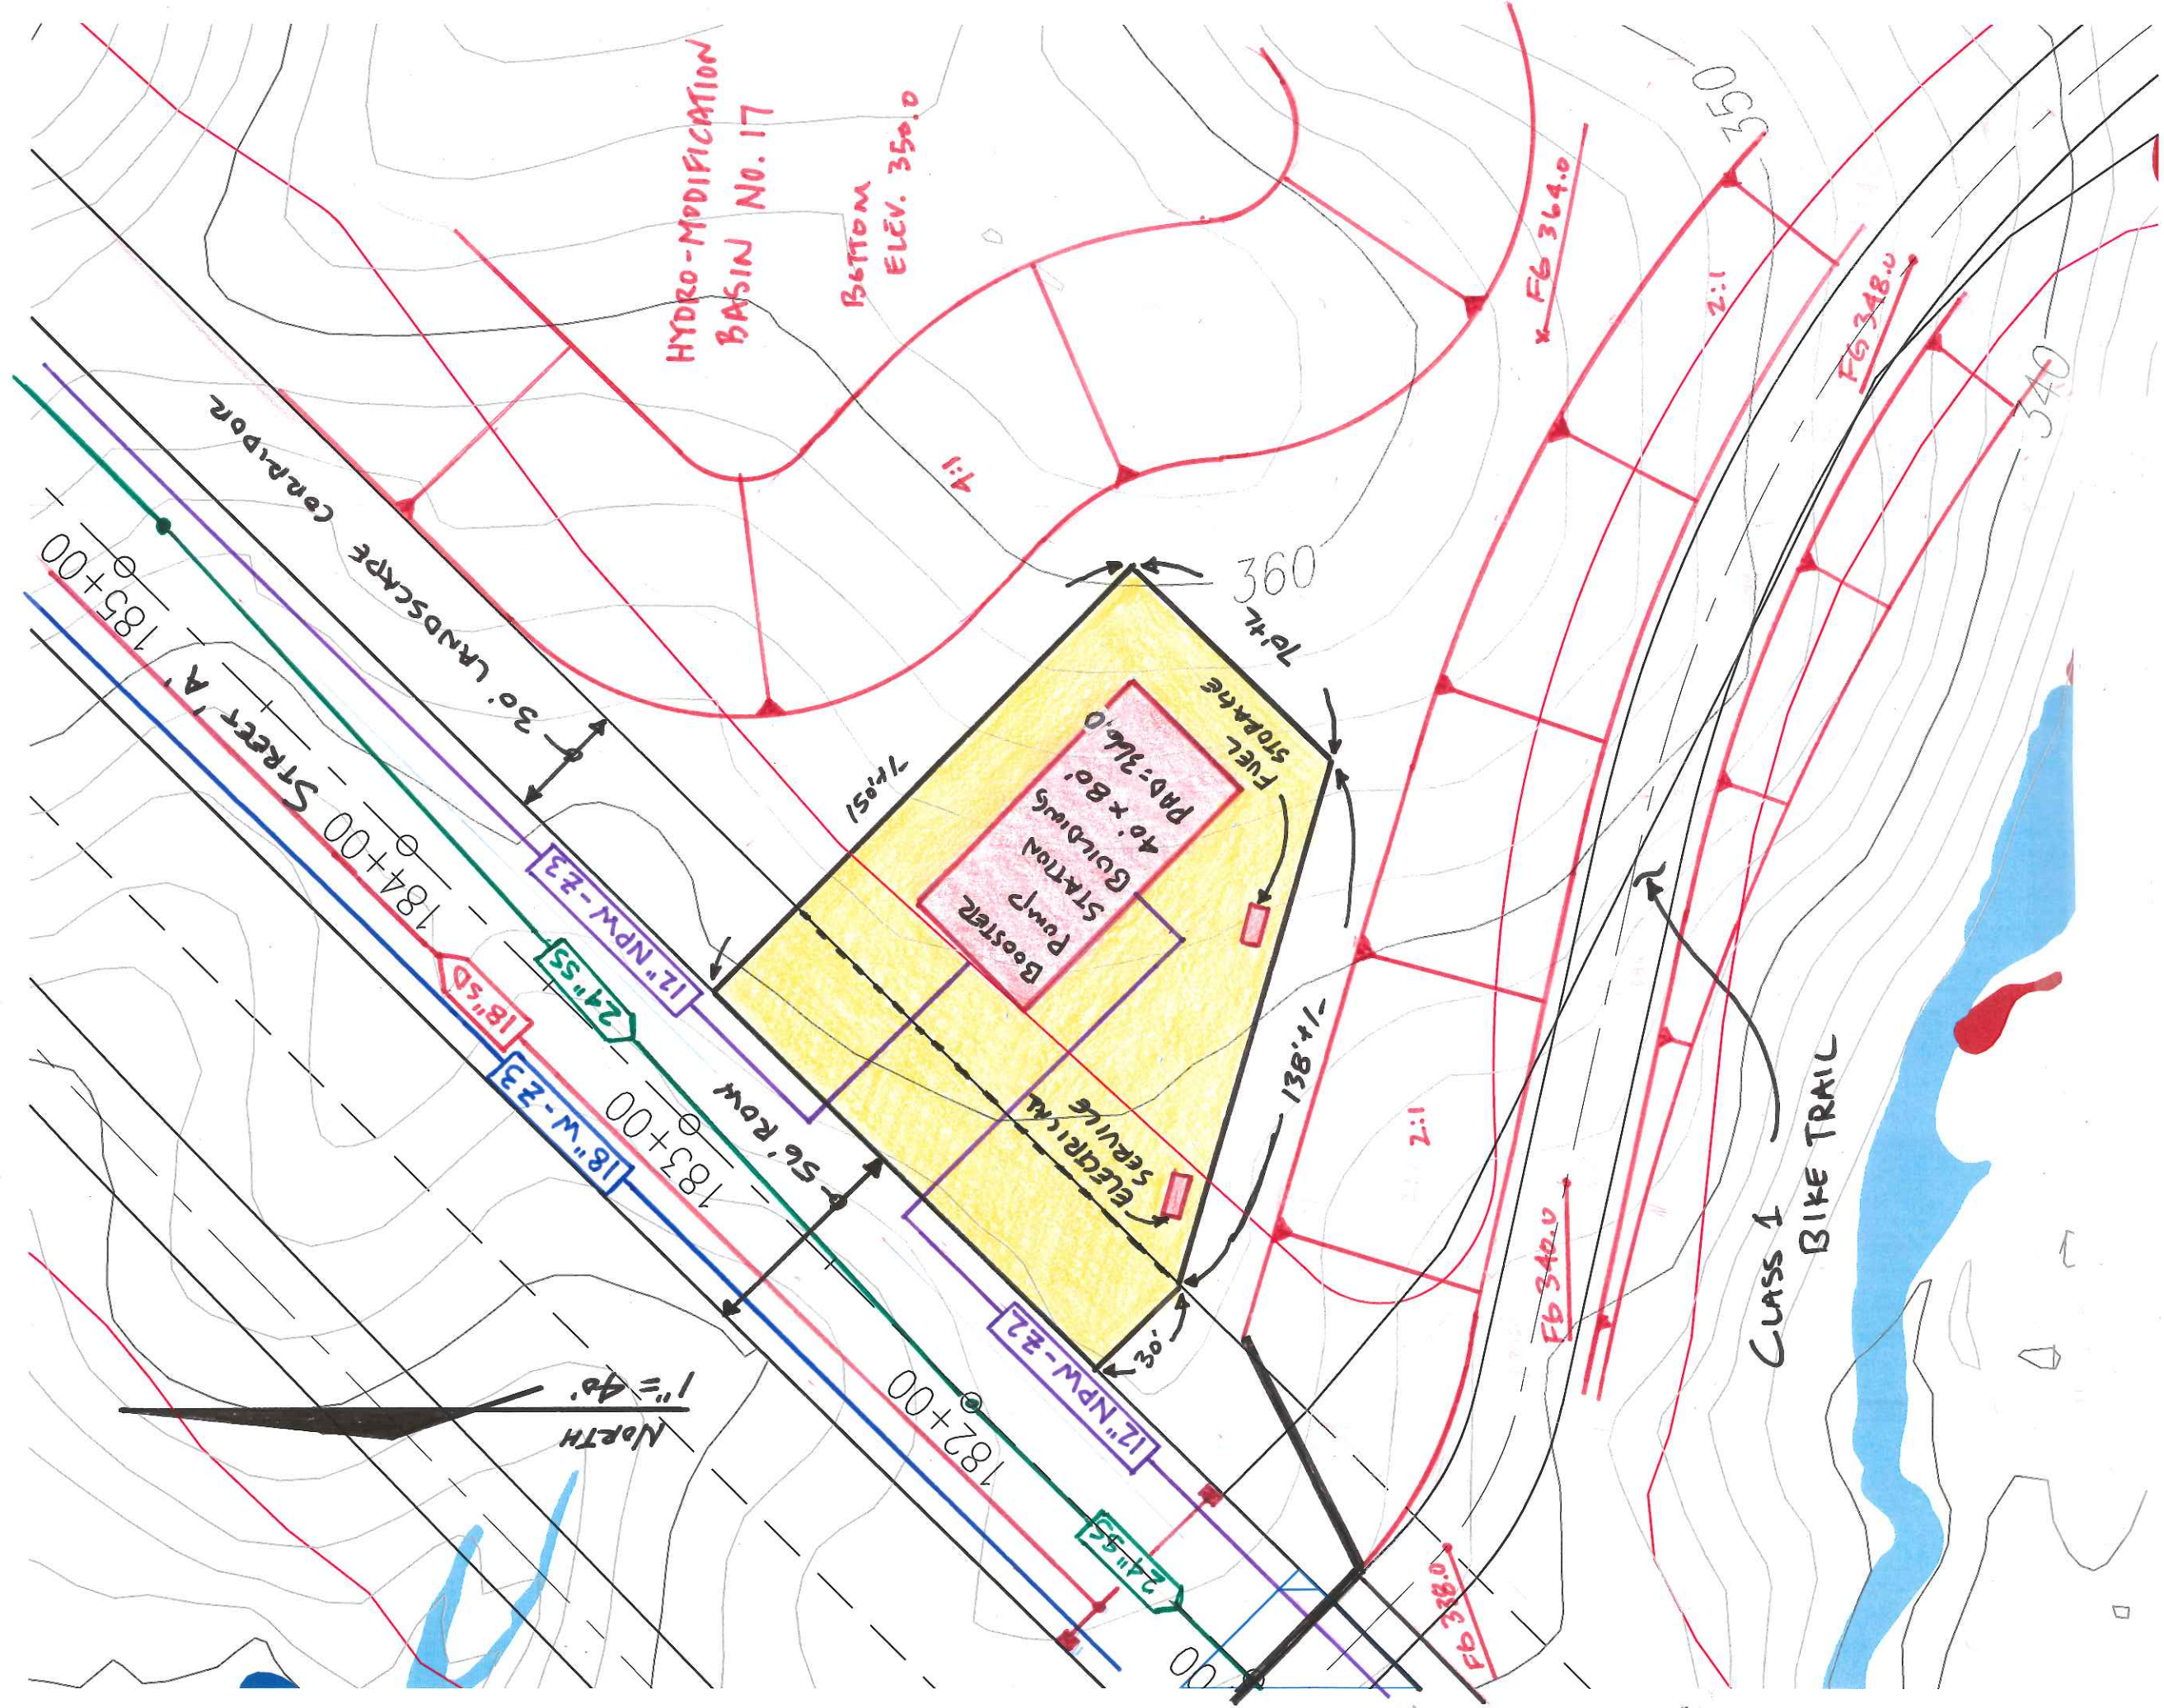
Zone 3 BPS Option 2 Site Layout
